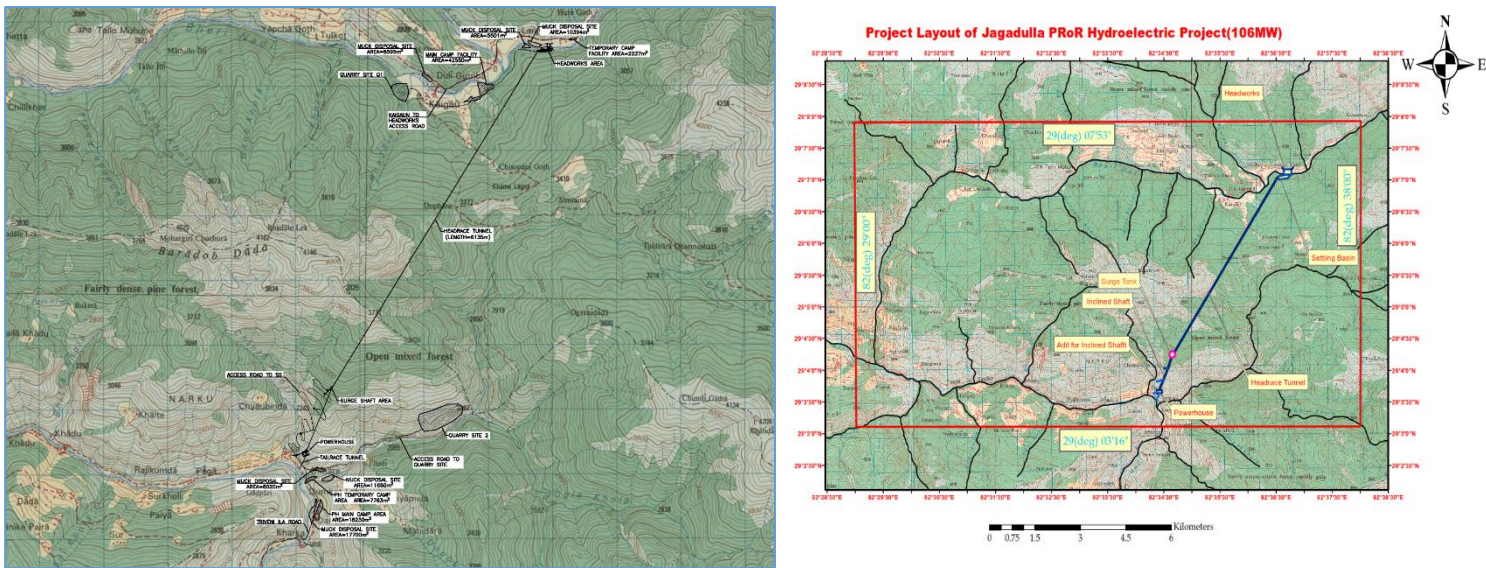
Layout & Plan of Jagdulla Hydroelectric Project
